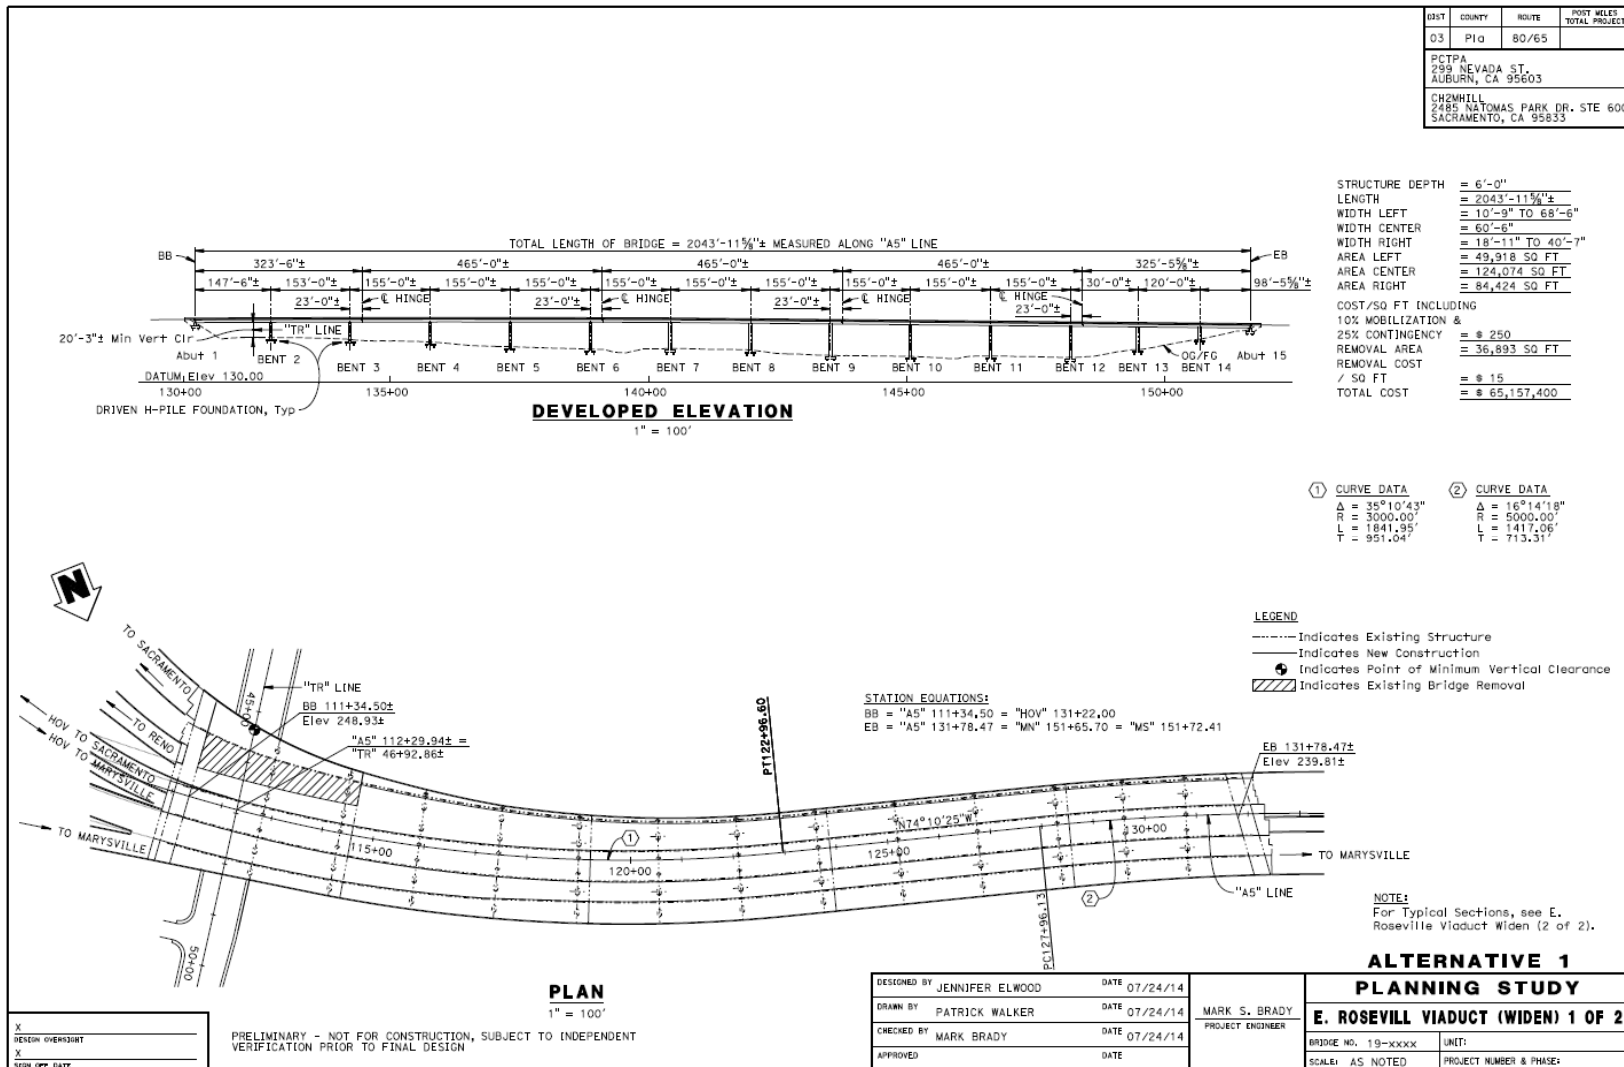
East Roseville Viaduct Proposed Bridge Plan (Alternative 1) (1 of 2)
